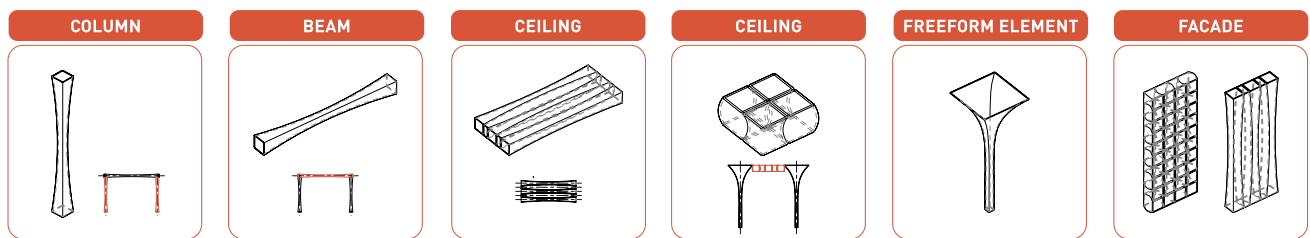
Geometric shaping possibilities of robotically wound timber components and possible modular architectural application, i.e., as columns, beams, structural slabs, free-form components or façade elements
